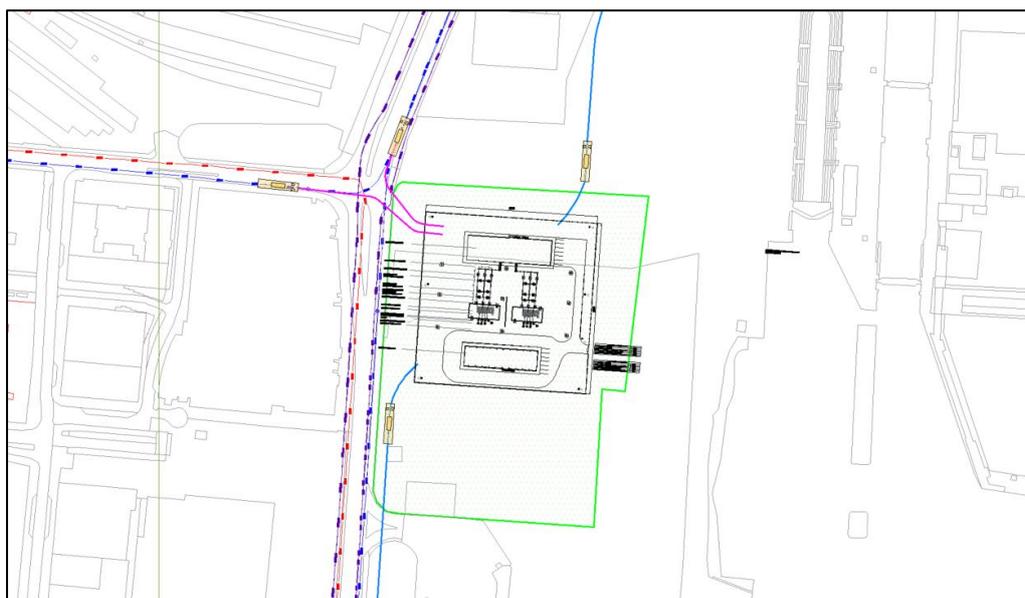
Potential Location 3 with generic substation layout and potential 220 kV tie in
